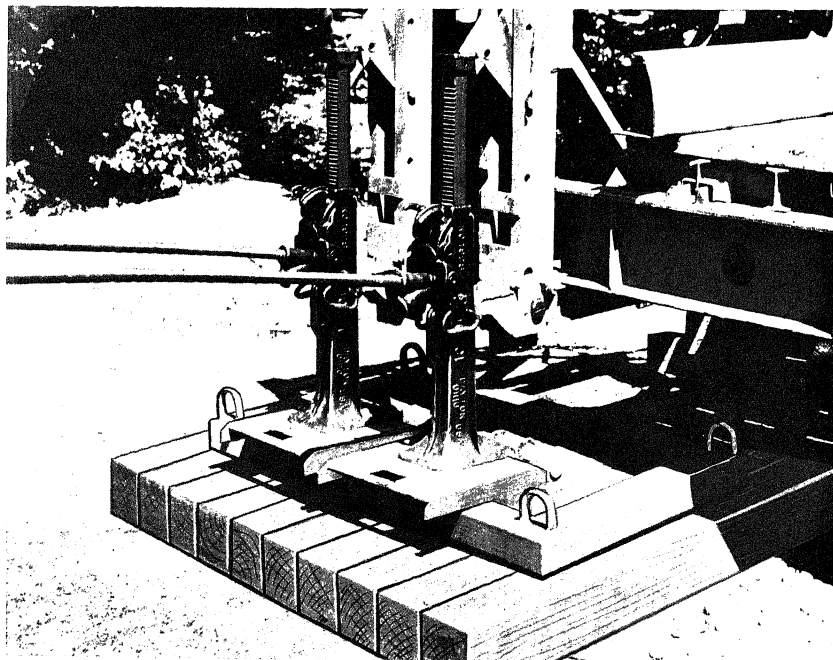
View of jacking operation showing the placement of the jack, jack shoe, and bearing.
